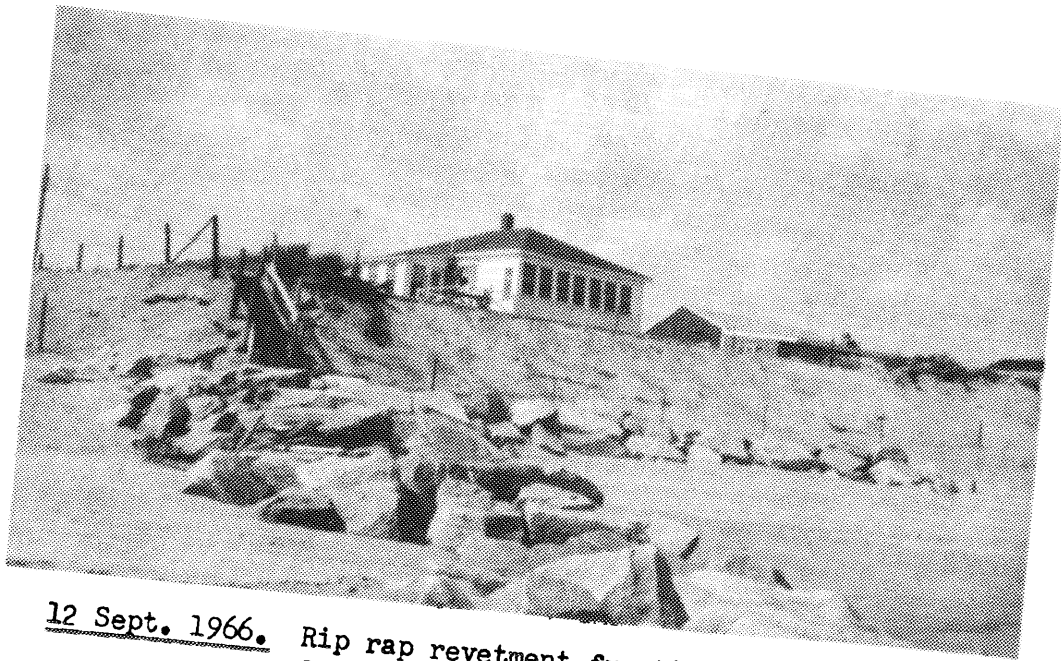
12 Sept. 1966. Rip rap revetment fronting cottage north of
